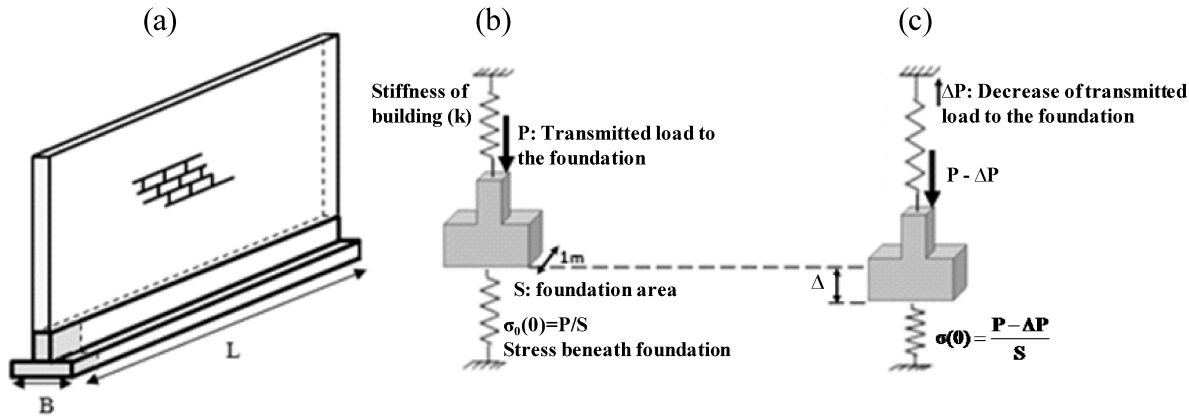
(a) Building flexural rigidity system composed of foundation (strip footing) and wall. Uni-dimensional model to study the soil-structure interaction, (b) initial state, (c) after undergoing the suction change.
